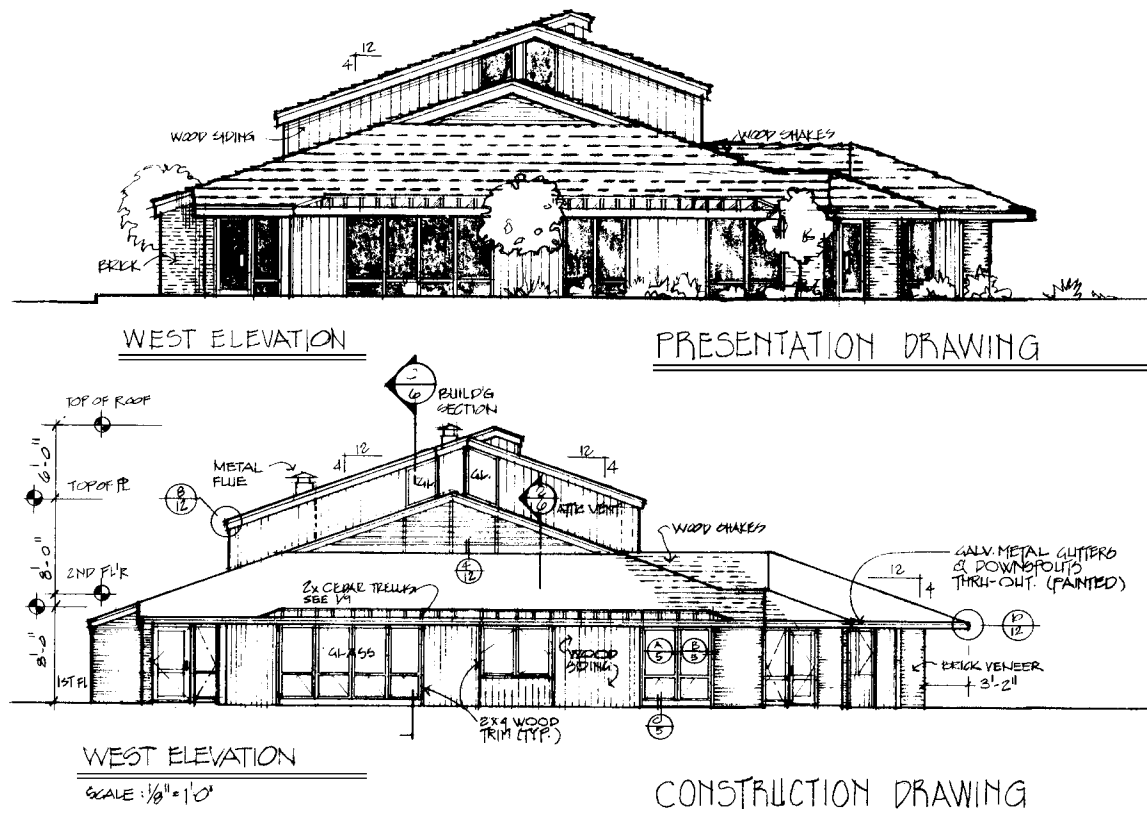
Elevations can be drawn as a presentation drawing or a construction drawing.
